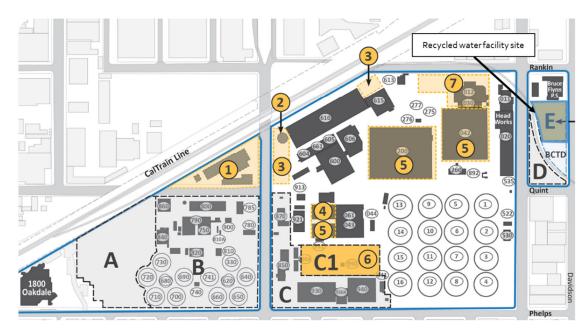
Recycled Water Facilities at SEP per the 2021 SEP Campus Plan (image adapted from WWE SEP Campus Plan Meeting, Sept 2021)
